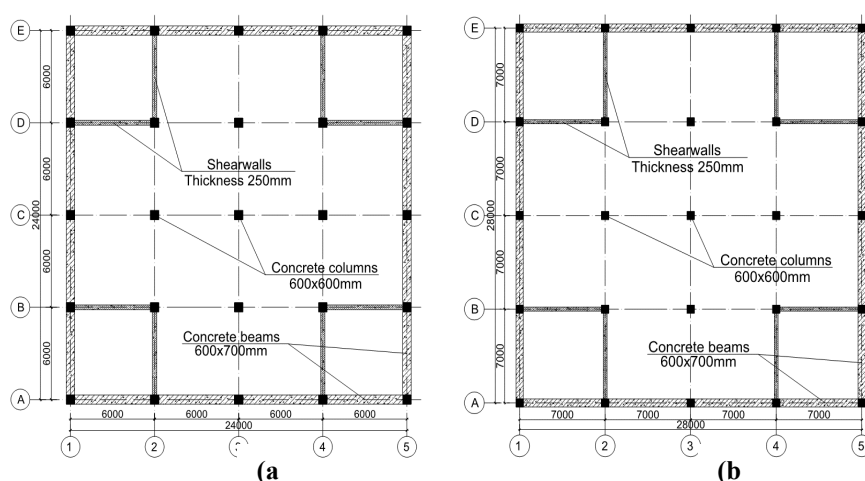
Building plans with 6m (a) and 7m (b) spans
